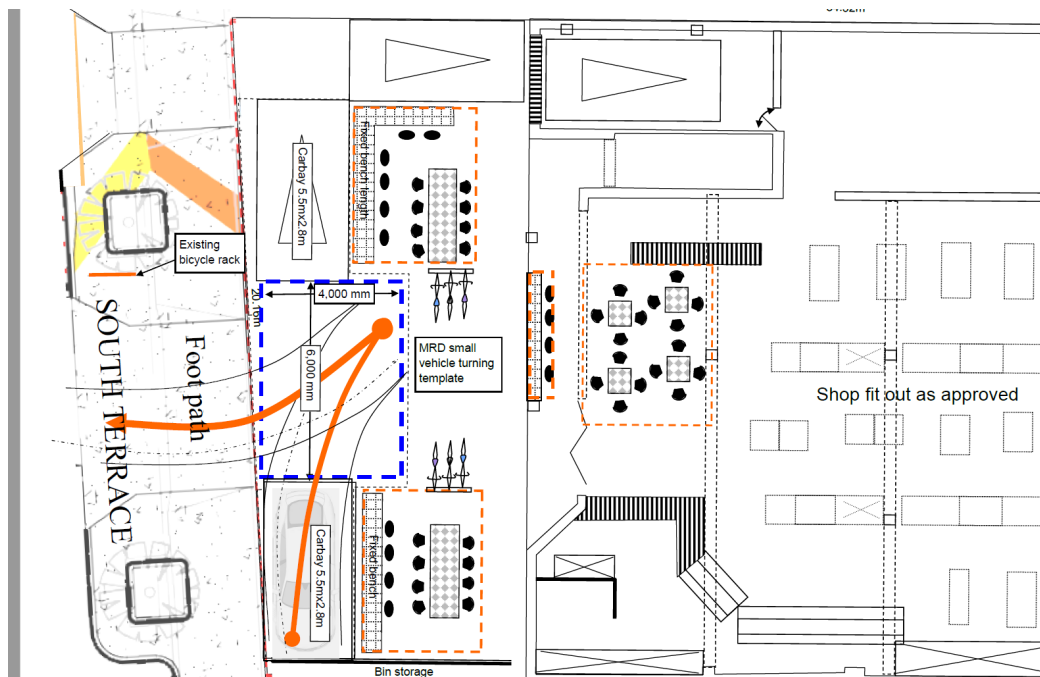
Option 1 – Two car bays on site, with modifications to the location of the installed benches
